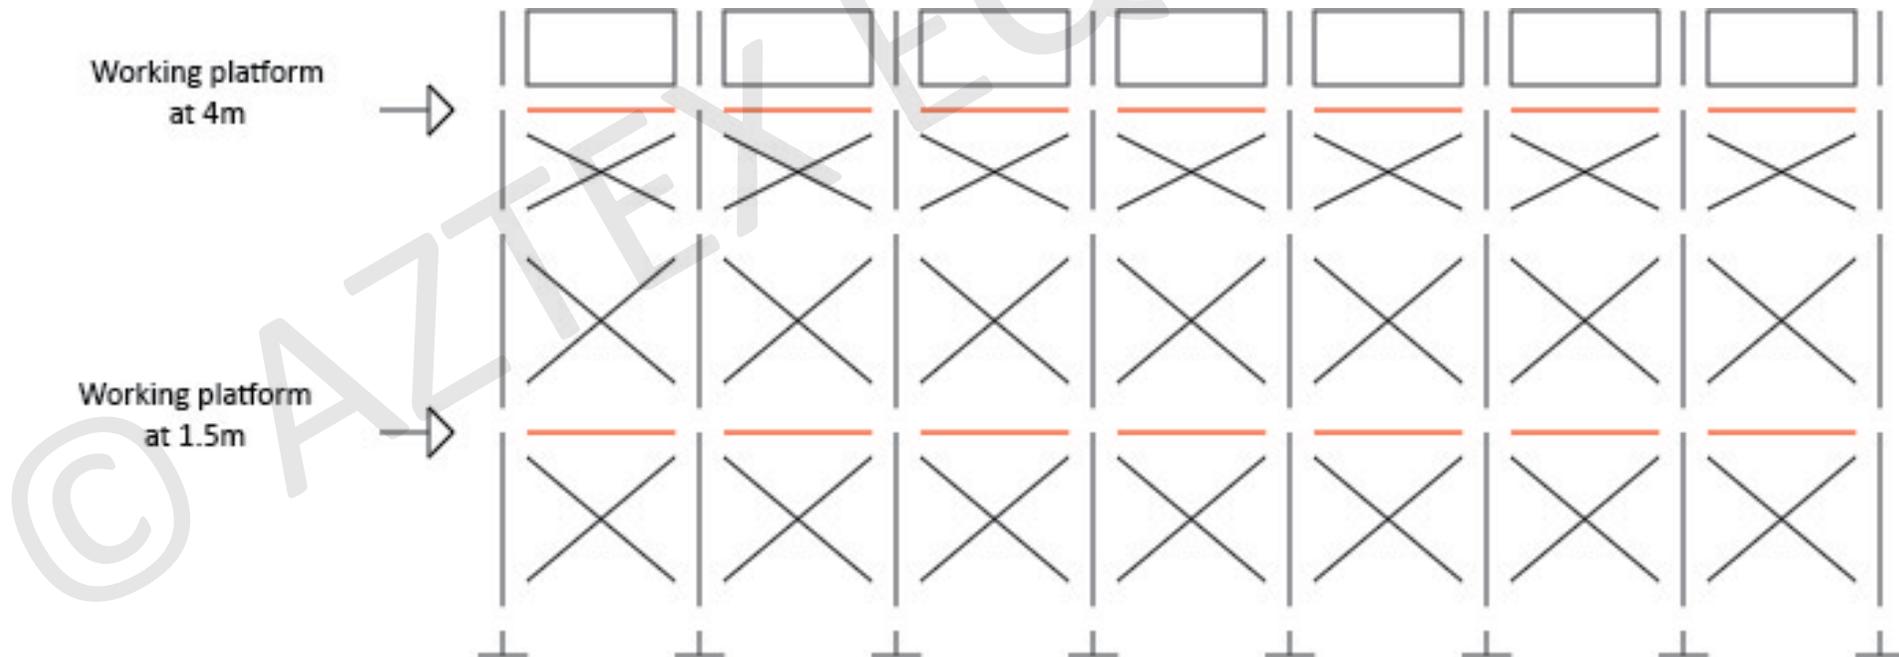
Figure X: Pictured is the same scaffold plan as on the previous page, note the working platforms hi-lighted in red.
